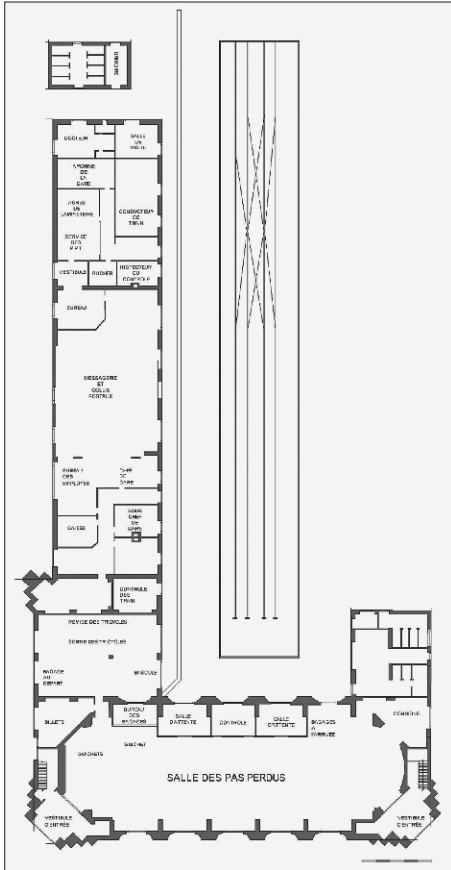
PLAN OF THE SECOND STATION OF BÔNE
